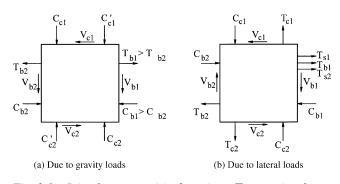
Joint forces at critical sections. T = tension force; C = compression force; V = shear force; subscript b for beam; subscript c for column; and subscript s for slab.
